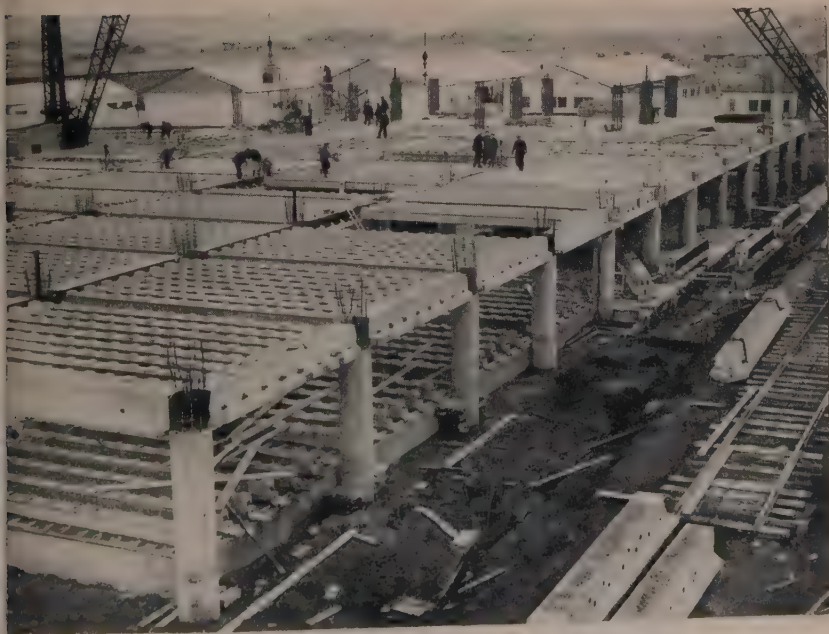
PRECAST PRESTRESSED UNITS IN PLACE BEFORE POURING CONCRETE
